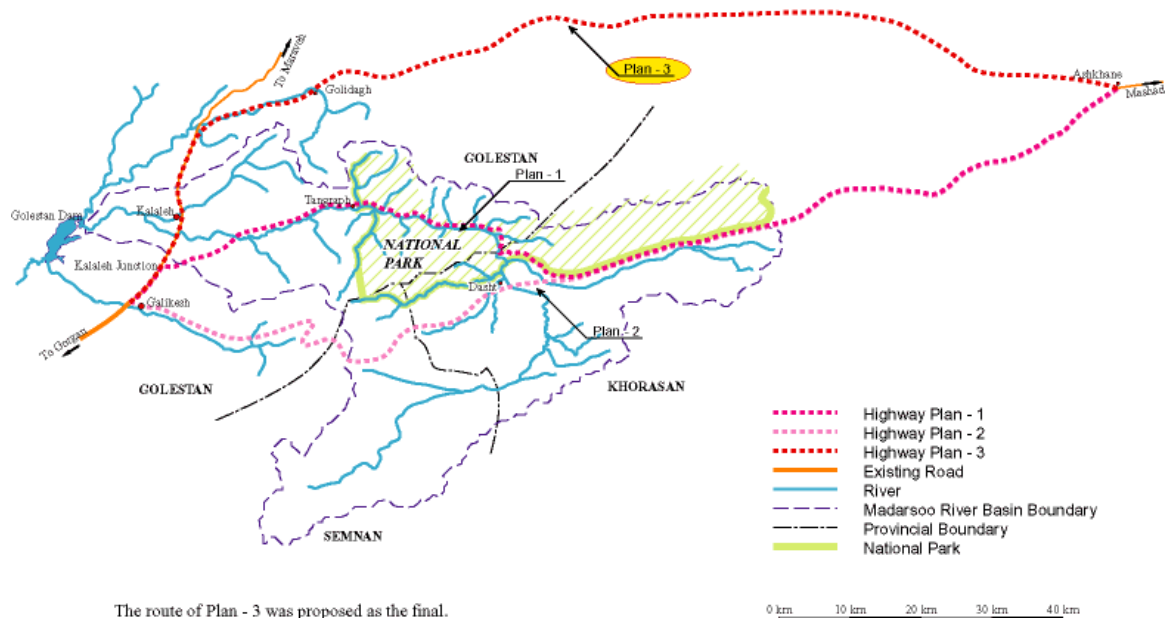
New Highway Plan proposed by MORT (Feb. 2005)
